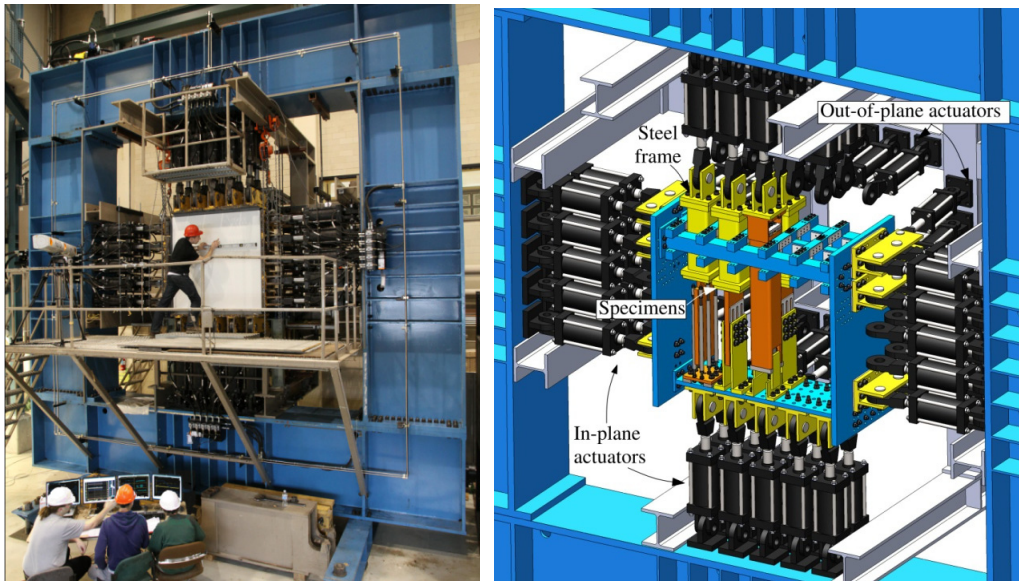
a) The Shell Element Tester (SET) with RC shell specimen in the lab, b) 3D illustration of the UT10 Hybrid Simulator steel frame with 4 specimens inside SET
